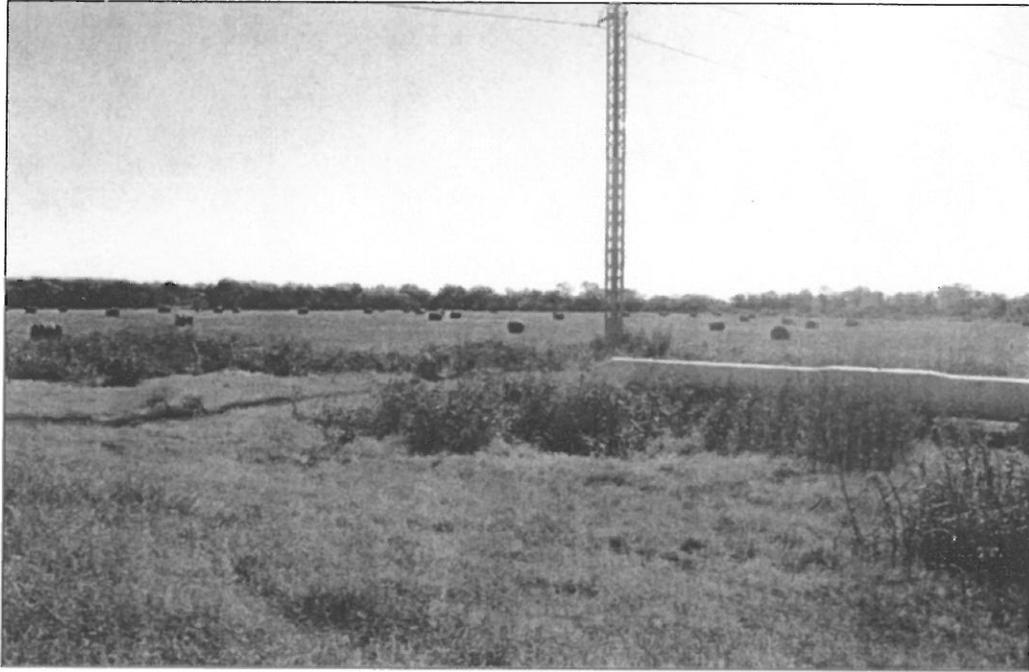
Overview of project area looking southeast from the Loop 410 access road. Note aqueduct pipe and overhead power line.
